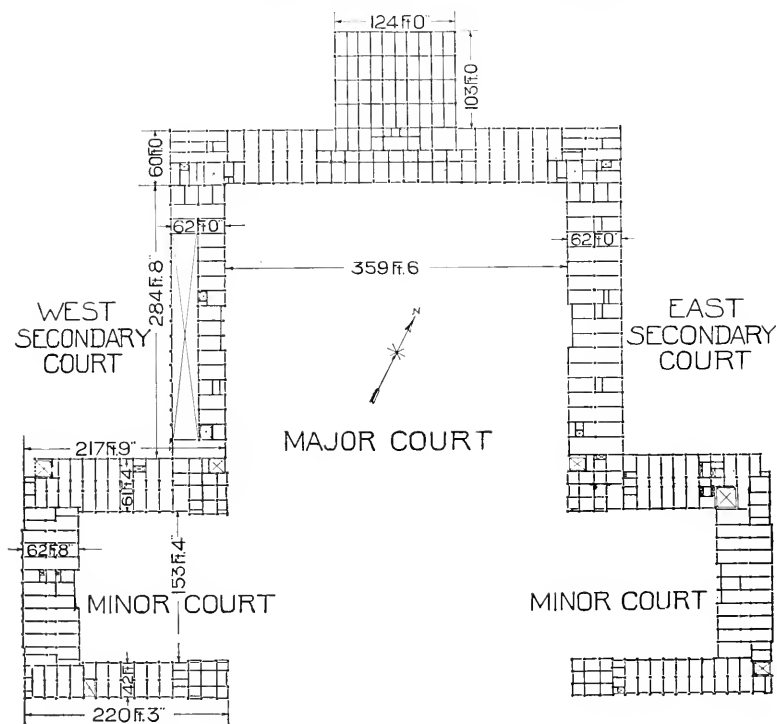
ARRANGEMENT OF BUILDINGS AND FRAMING PLAN OF SECOND FLOOR.
